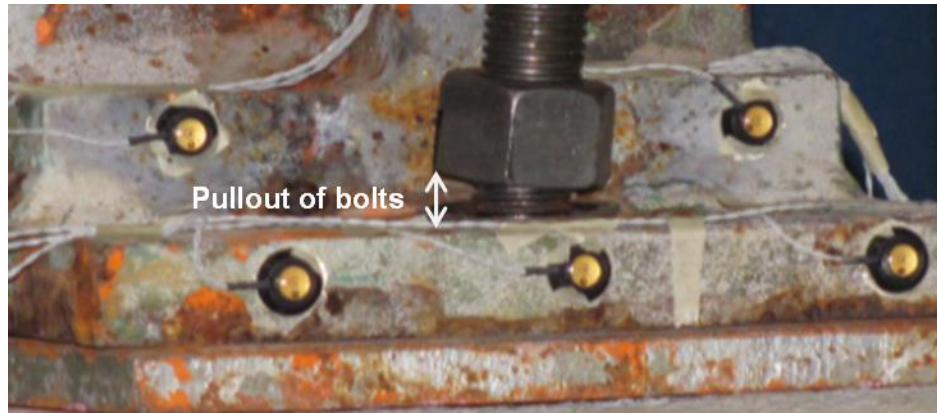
Photograph showing pullout of the anchor bolts under combined tension and shear due to bond failure between the bolts and the concrete
